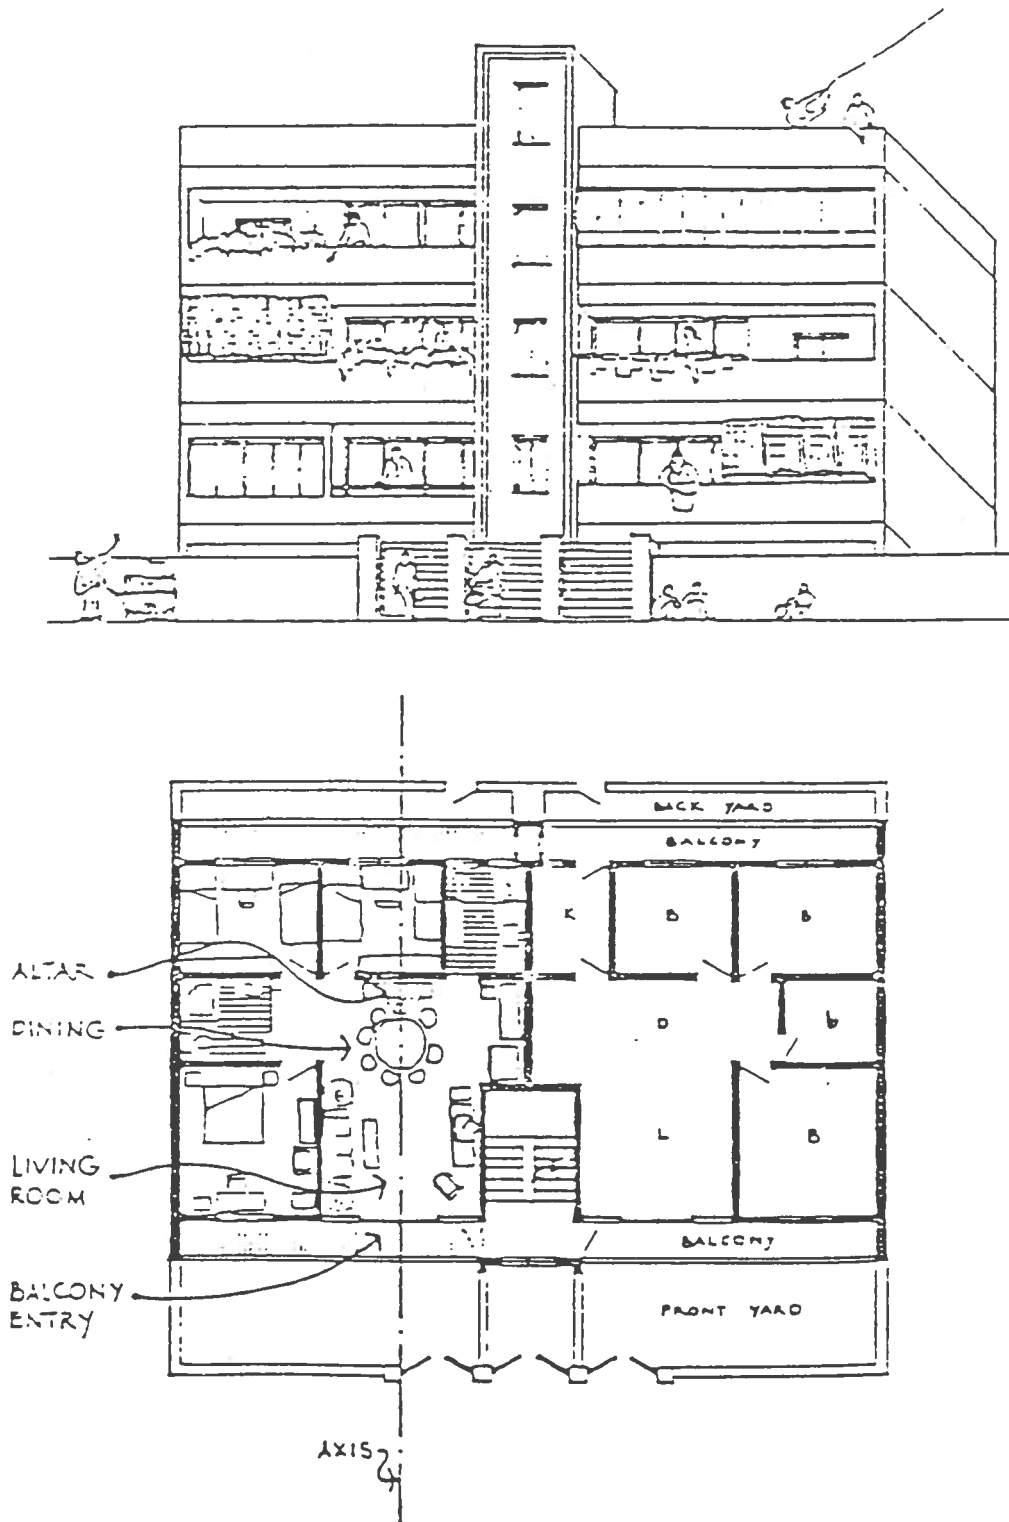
Elevation and Plan of the Taiwan's Typical Duplex Condo
